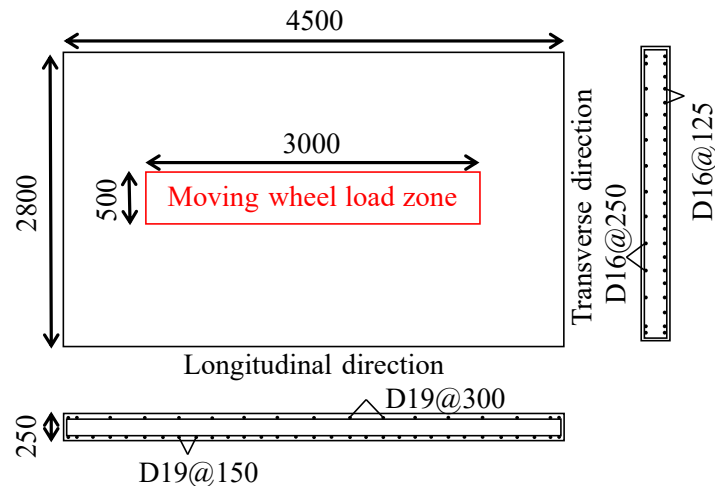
Dimensions and reinforcement details of the panel slab (mm)
